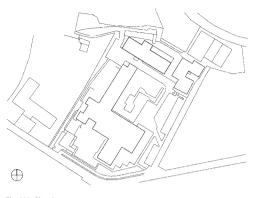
Site plan The new building at the foot of the Hoffelsen in Chur
